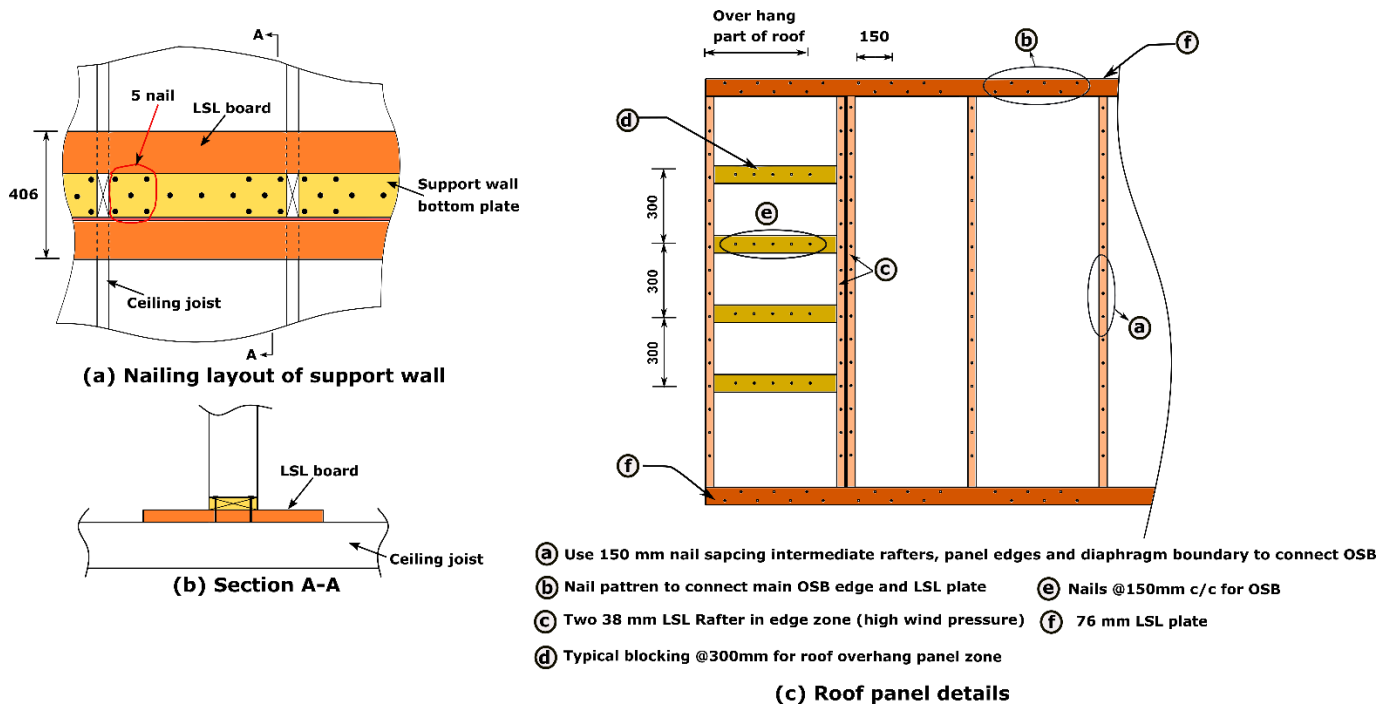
(a) (b) Support wall nailing details, and (c) Roof Panel details (all dimensions are in mm).
